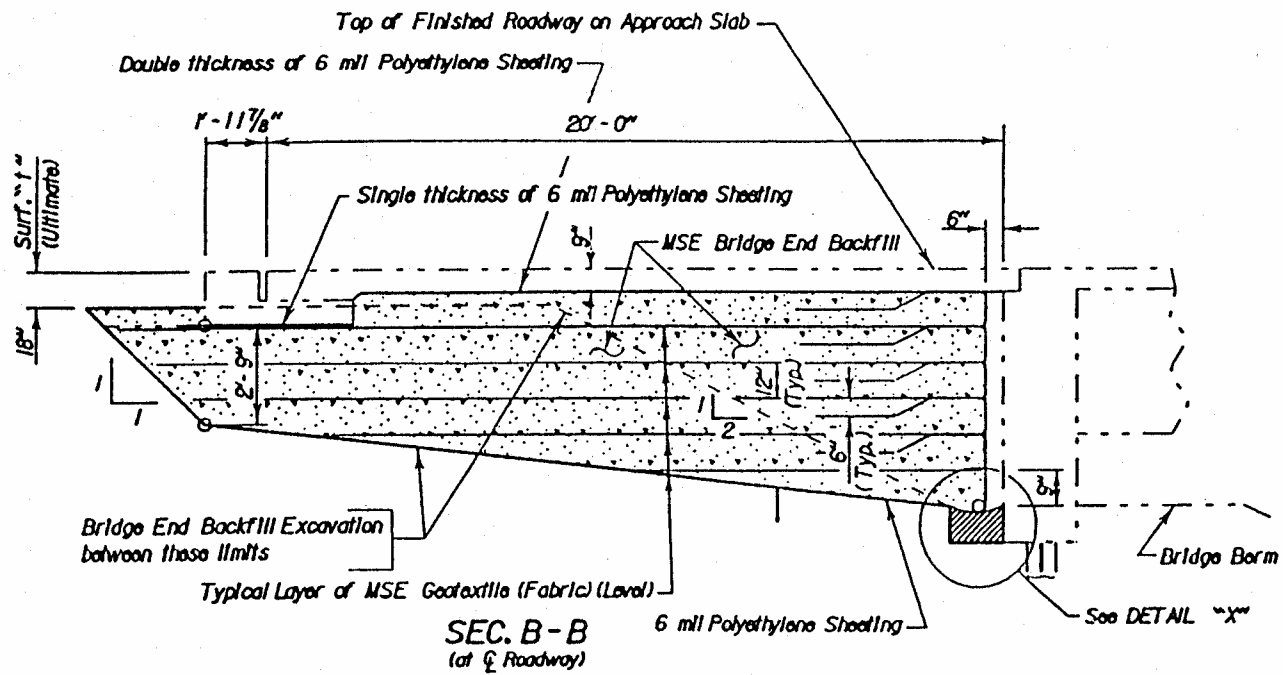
Design detail of a typical geotextile reinforced soil wall behind the integral abutment as of 1999
